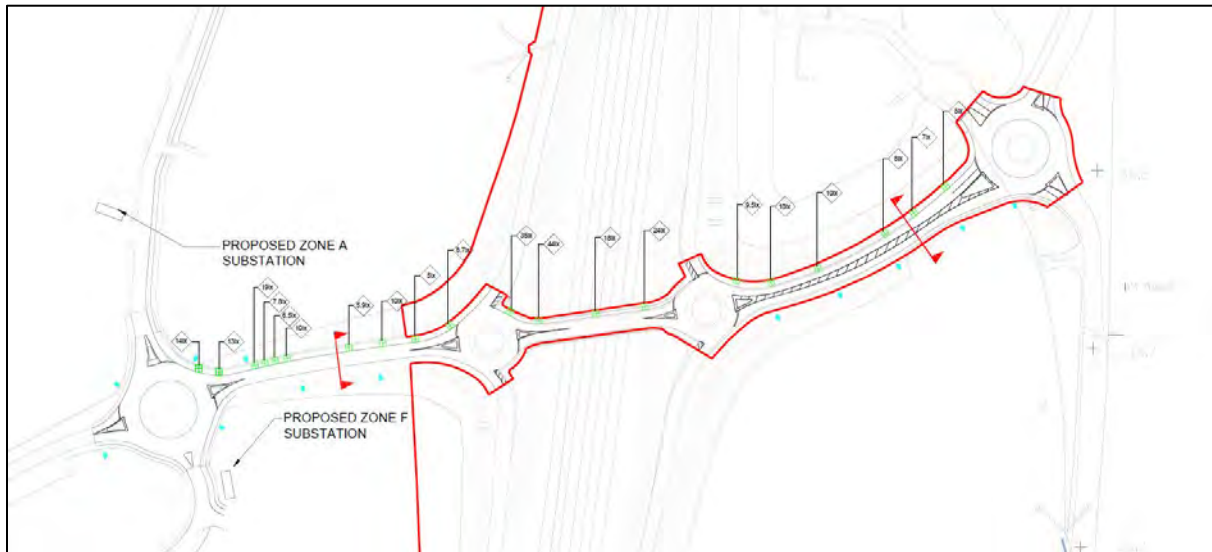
Existing Lux levels on Bhailsigh Road/R132
